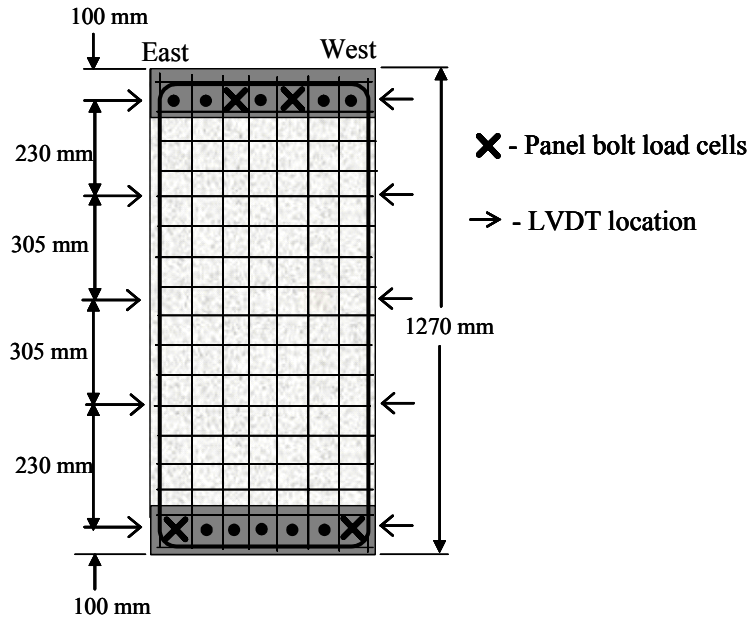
Location of horizontal LVDTs above stiffened reaction beam and panel bolt load cells
